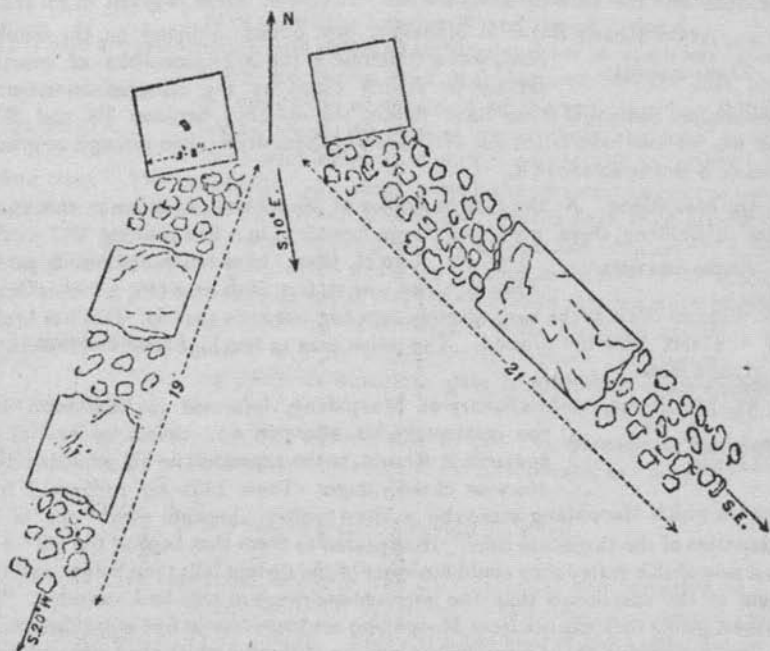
Plan of overturned gate pillars at entrance to Inglis' house, Cherrapunji.
